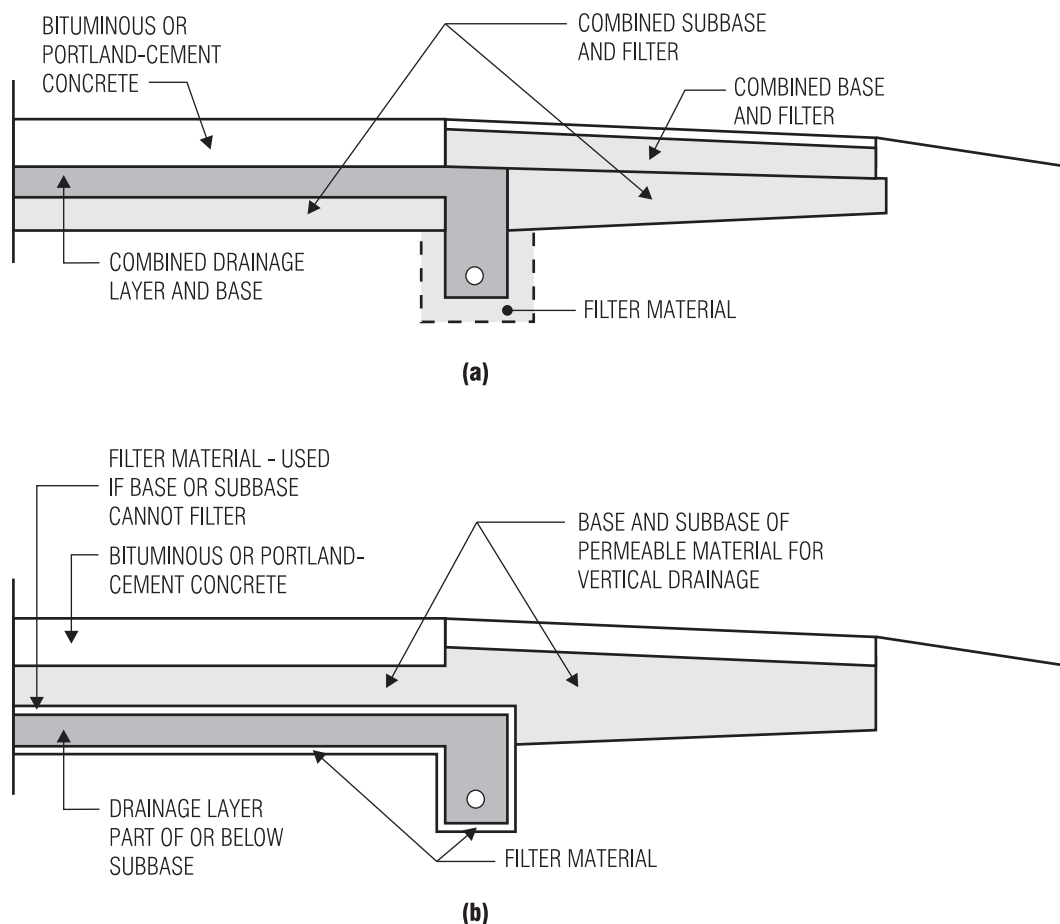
Drainage layers under pavements: (a) base used as the drainage layer; (b) drainage layer as part of or below the subbase.
